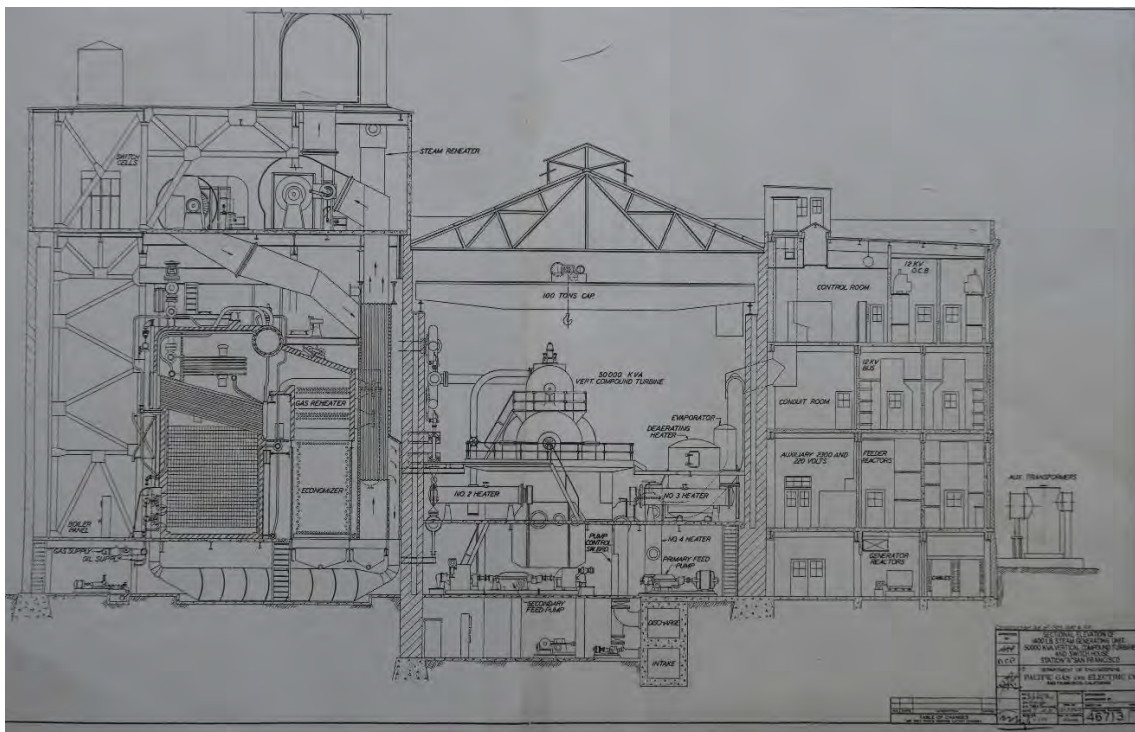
Sectional (north) elevation of Station A showing (from left to right): Boiler Hall, Turbine Hall, and Switching Center. Drawing by PG&E Engineering Department. Source: Associate Capital.
